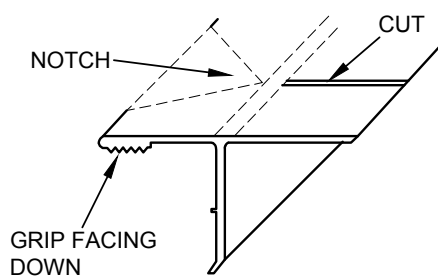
CLOSURES – FLANGES - 1 3/16 IN. (30 MM) PANEL
